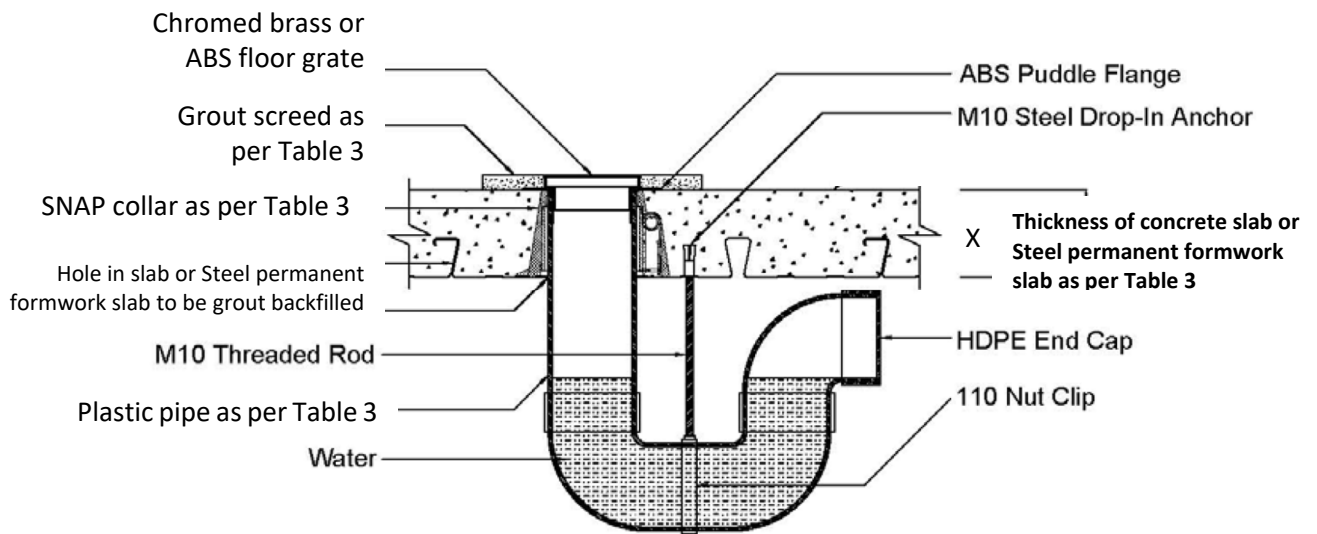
Example of installation of SNAP H100FWS-RR collars with floor waste pipes in concrete slab/concrete with steel permanent formwork slab
